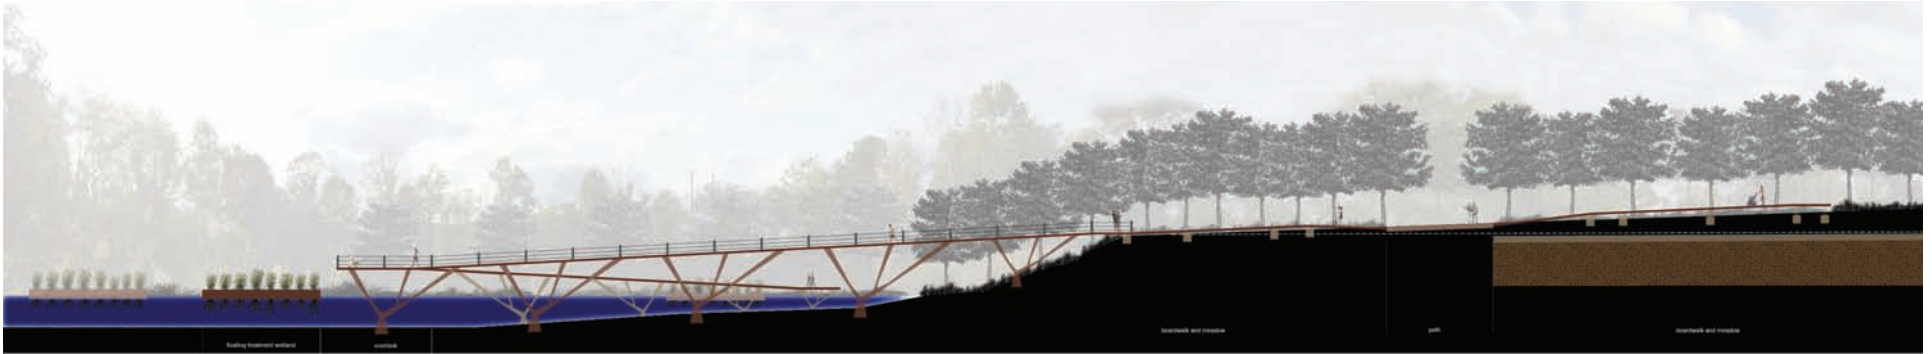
section b-b'. Section looking west through boardwalk (entrance near pond section of walk).
